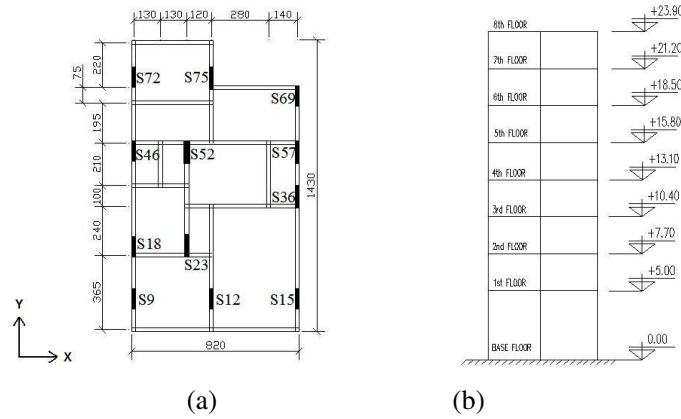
(a) Plan View (cm), (b) Lateral View (m)
